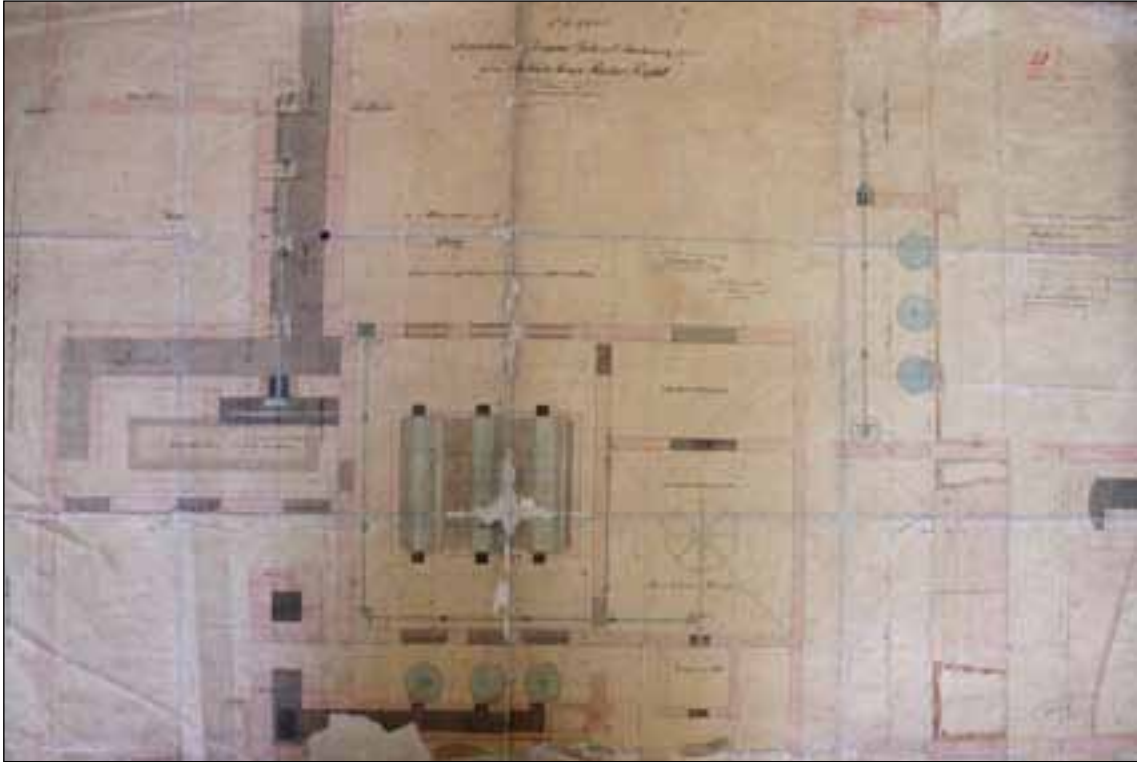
Plan of 1856 showing the layout of the engine house, boiler house, chimney and well house (EHA MD 95/2796)
